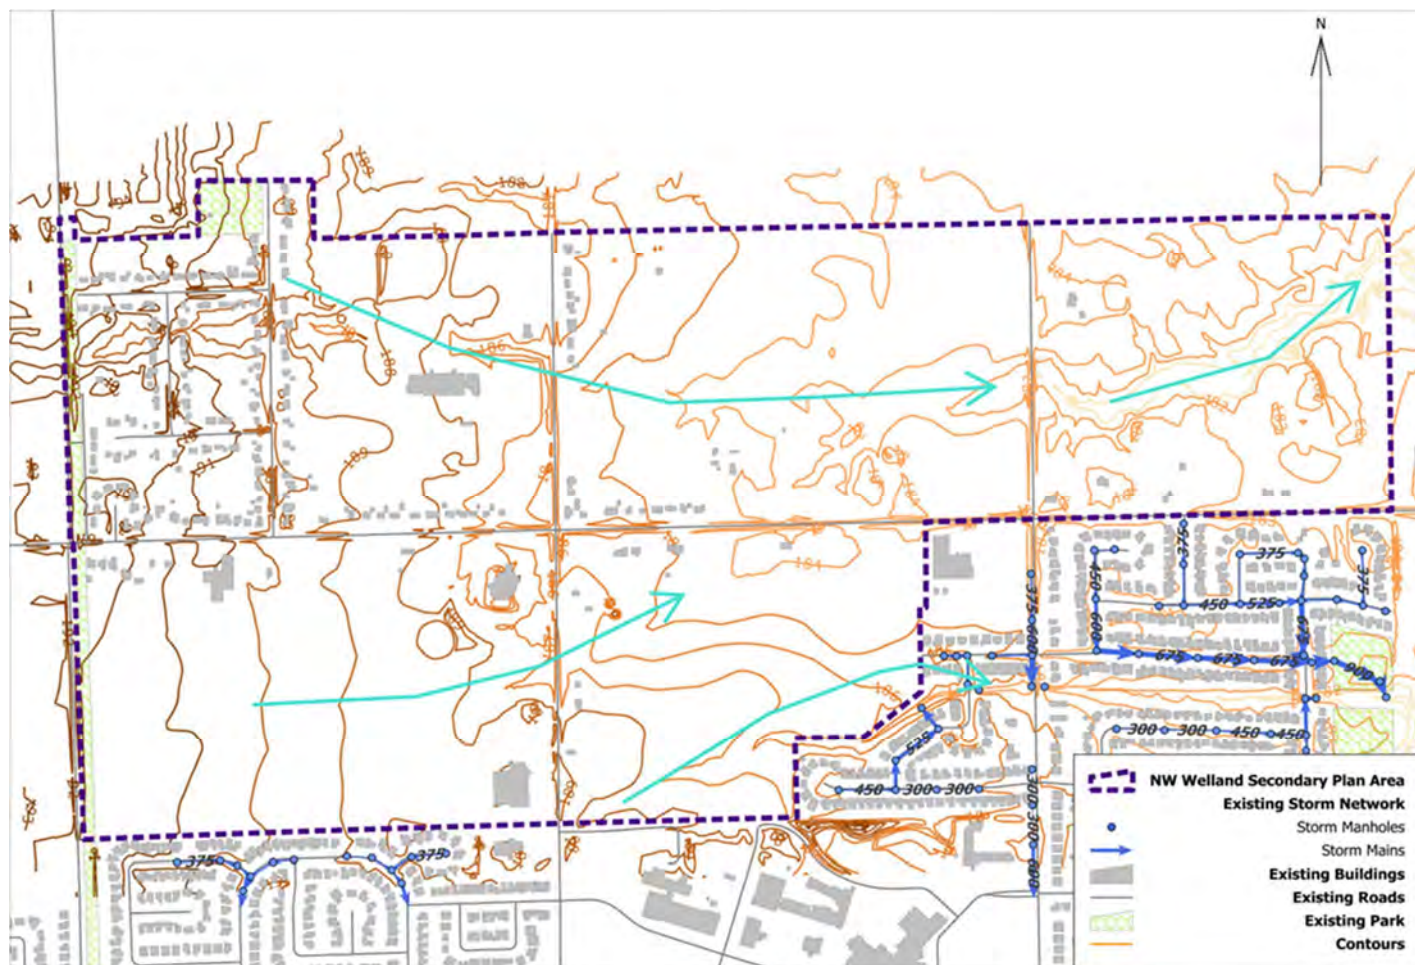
Schematic of Existing Stormwater Drainage Path
